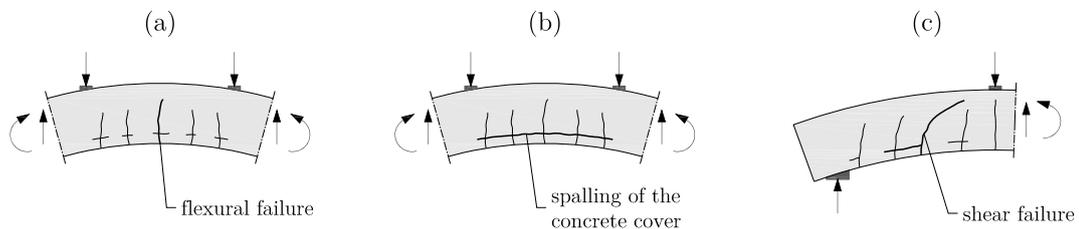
Failure modes of arch-shaped members: (a) flexural failure; (b) spalling of concrete cover; and (c) shear failure.
